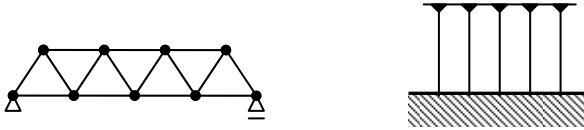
, b Examples of a serial and a parallel system: a) a truss beam (left) and b) a floor on multiple clamped columns.
